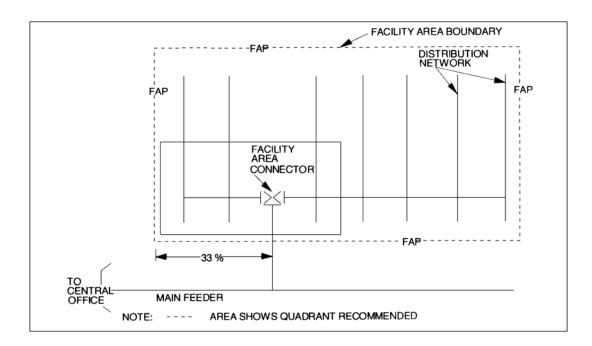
Location of Connector Streets Perpendicular to Feeder Cable Route
